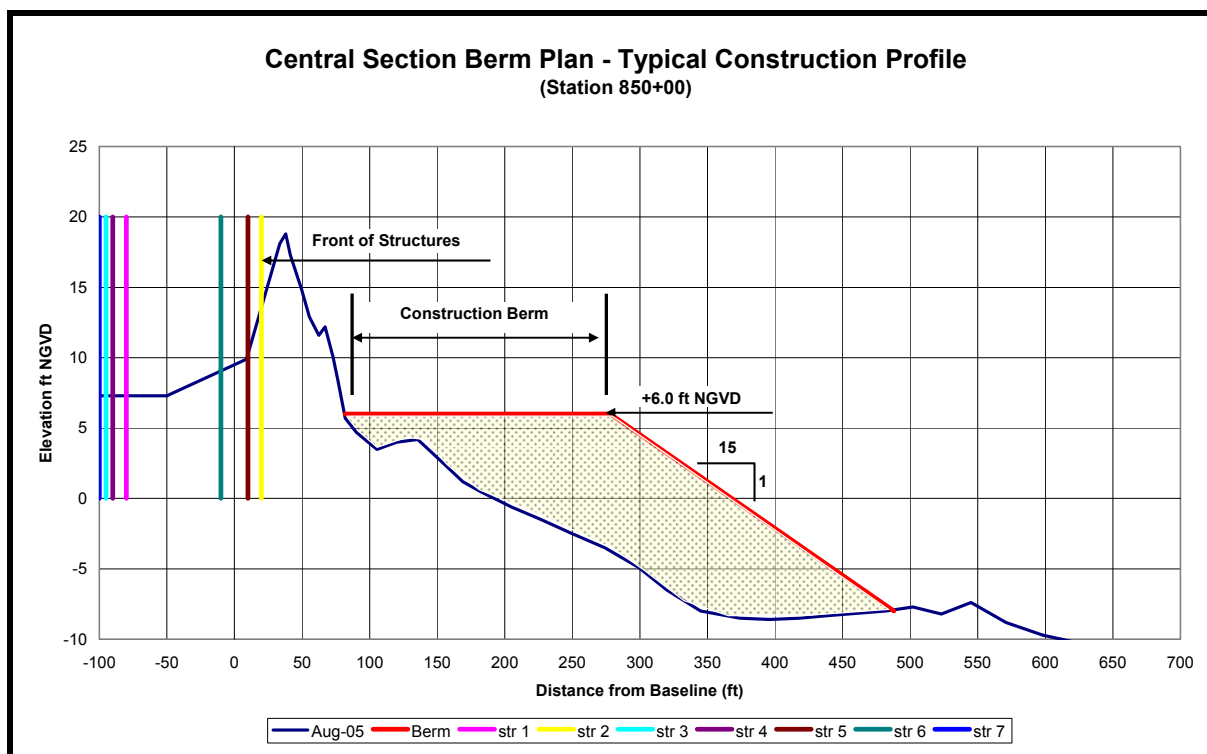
A. Typical construction profile, Central Section Berm Plan (Station 850+00).
